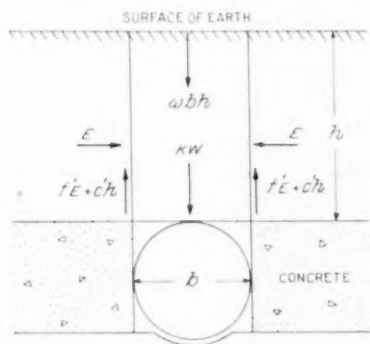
SKETCH SHOWING PIPE RIGIDLY SUPPORTED WITH CONCRETE AT THE SIDES AND EARTH FILL ON TOP
